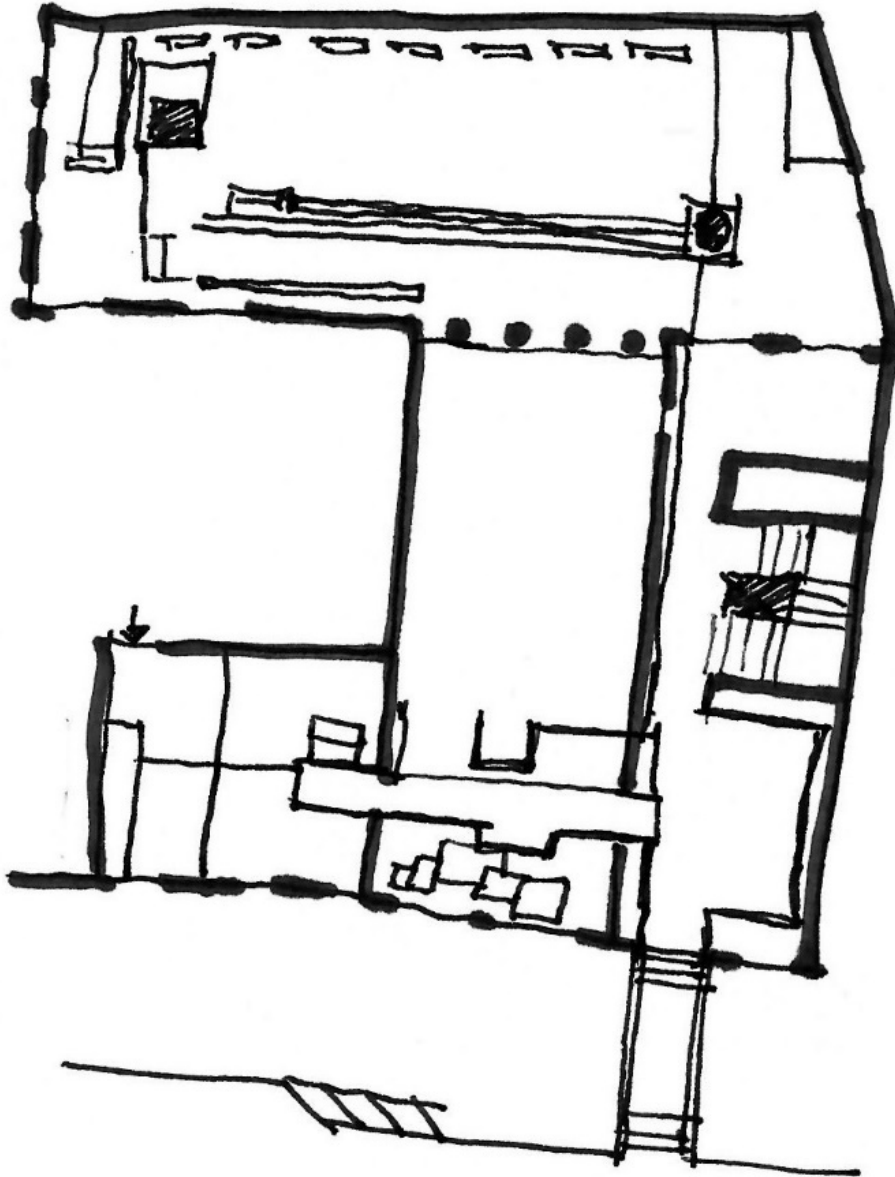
The renovated ground floor plan highlights the path stormwater takes through the site, Querini Stampalia, Venice, Italy, 1963.
